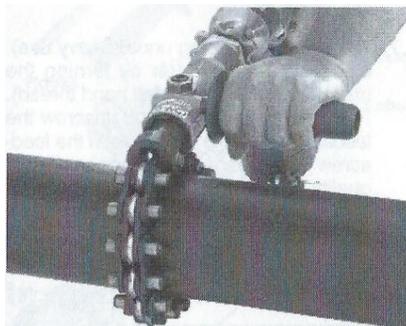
Operating the Powered Soil Pipe Cutter - Using Impact Tool
